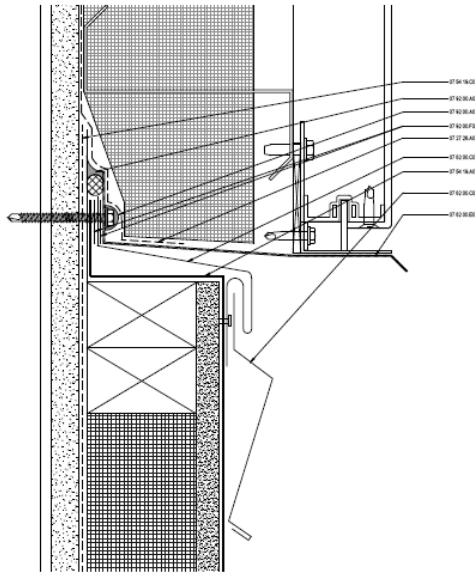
| Metal Panel Connection Detail (SmithGroupJJR)
